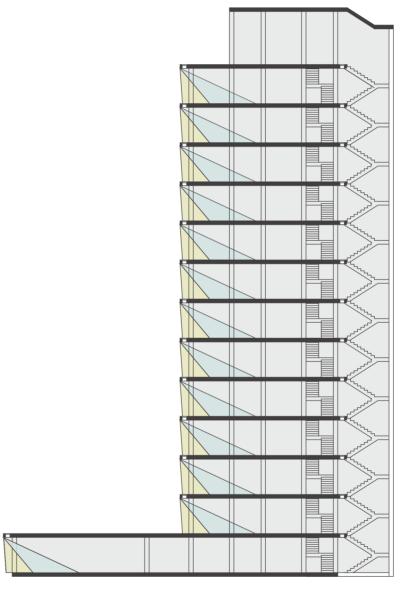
Section of building indicating sun angles and efficacy of brise soleil (by Author)
